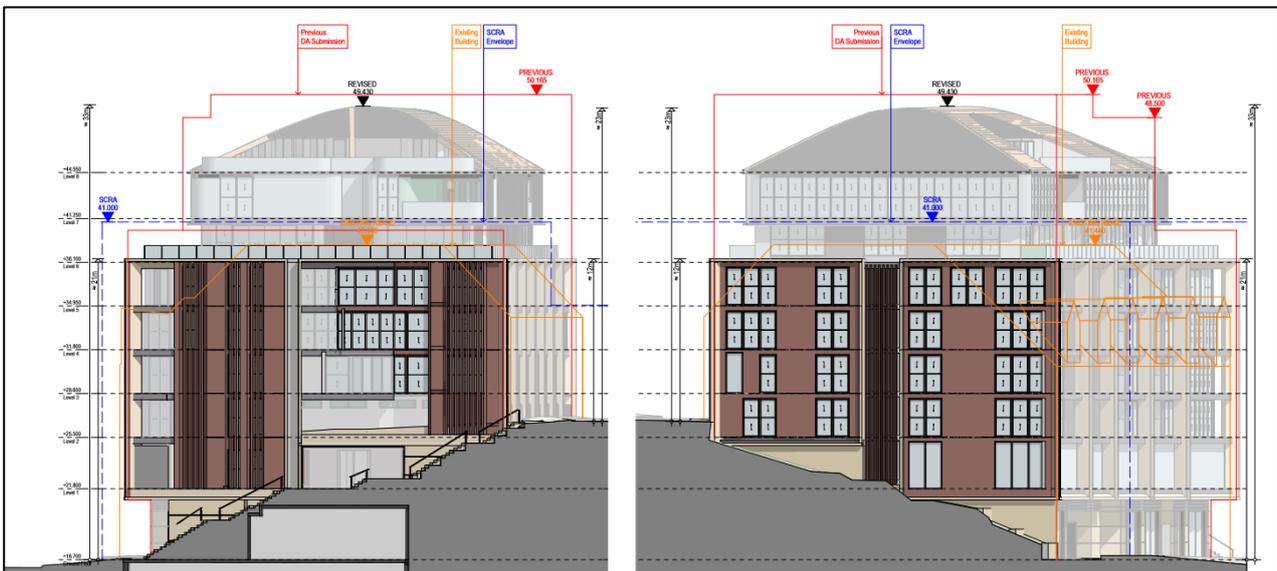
Left: northern elevation (Baker's Terrace & Building 2); Right: southern elevation (Cahill Expressway) of Building 1 (Source: Architectural Plans)
